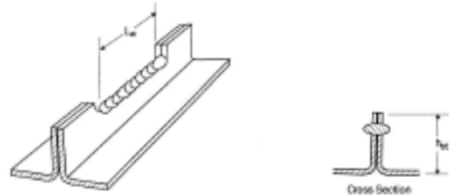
Top Seam Weld - Back-to-Back Vertical Leg Joint
